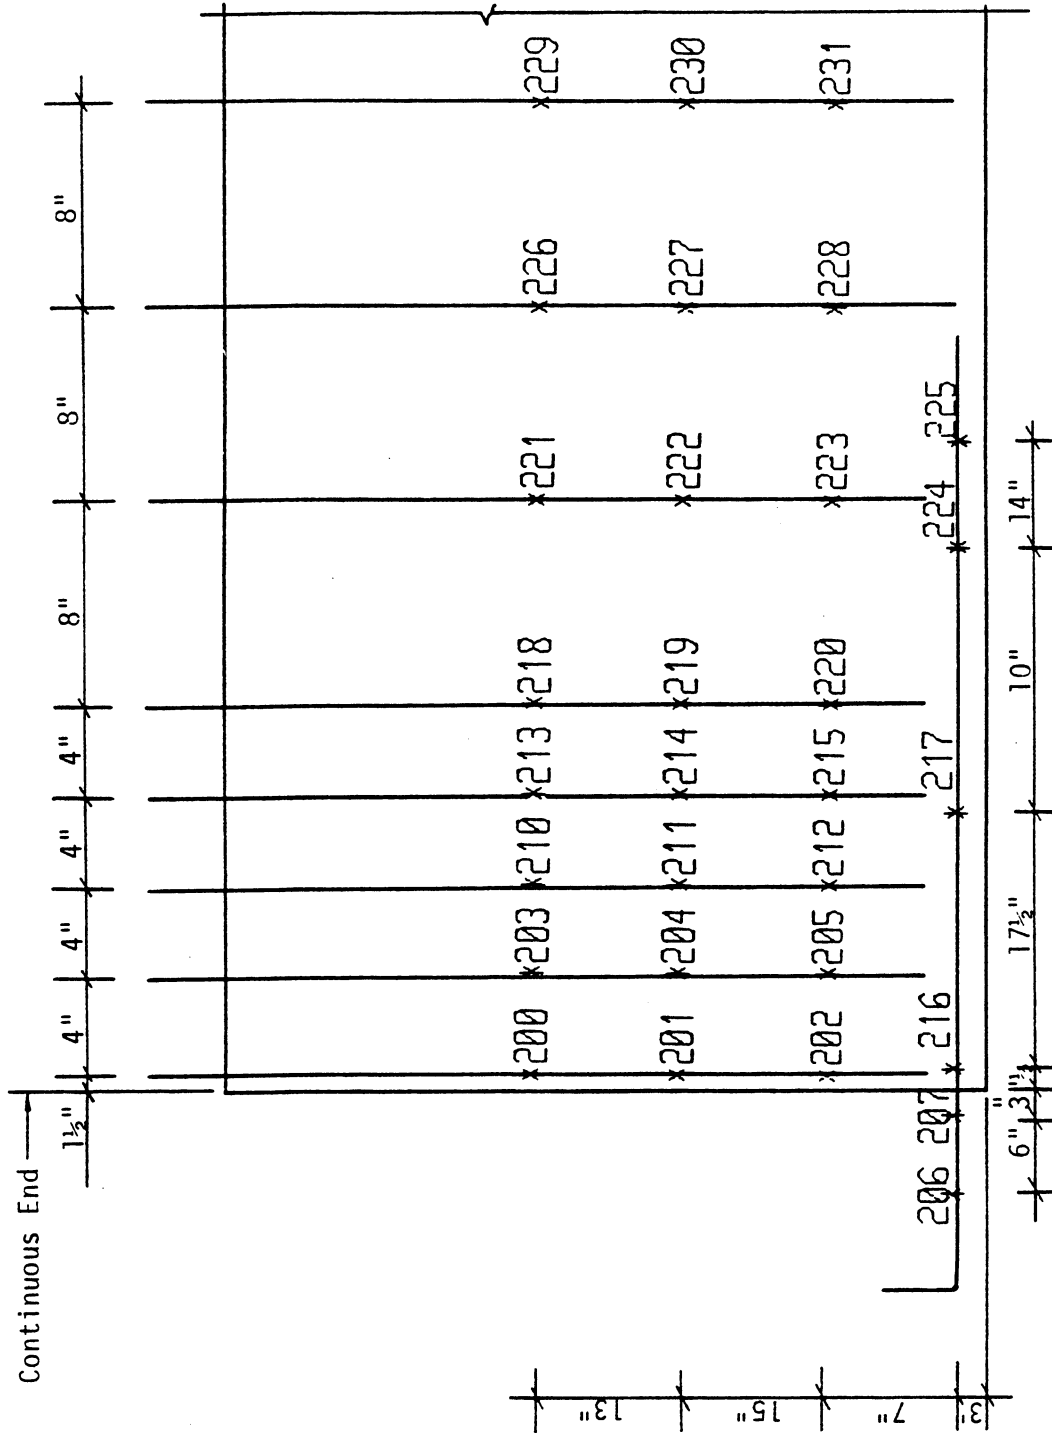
a Laboratory Test - Configuration of Strain Gages on Stirrups of Girder B
